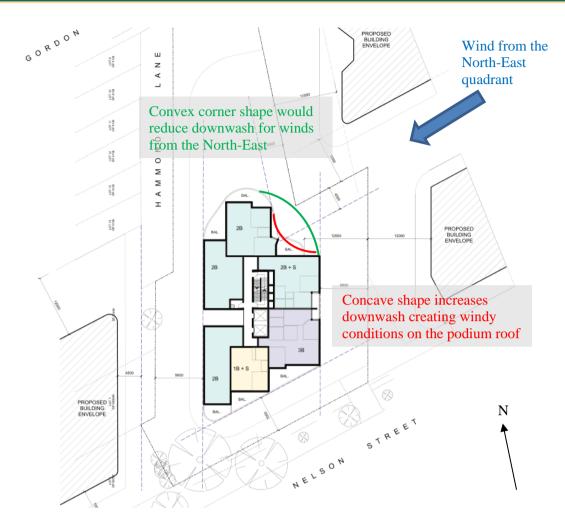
Typical tower floor plan (Level 8-19) marked up for wind from the North-East.
